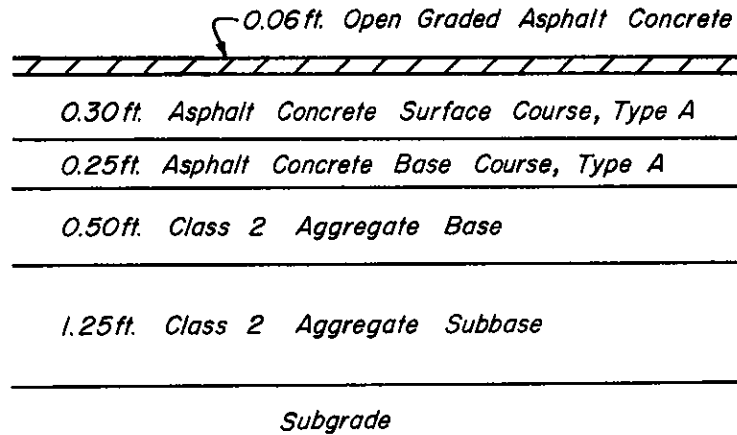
Structural section, Gonzales By-Pass (V-Mon-2-C).
